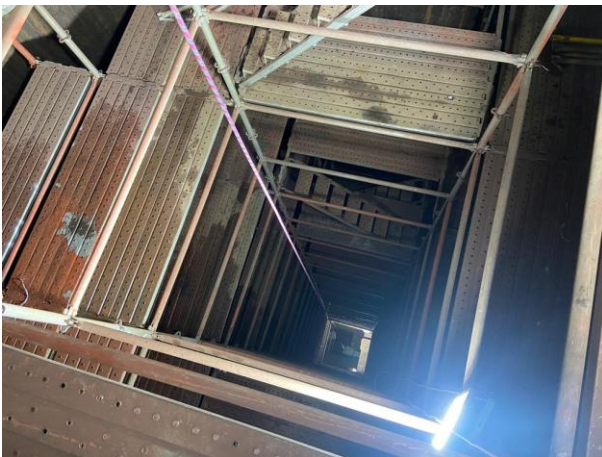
A safety barrier was installed for the construction of scaffolding in the conduit of Unit 3 (Status in May 2023)
